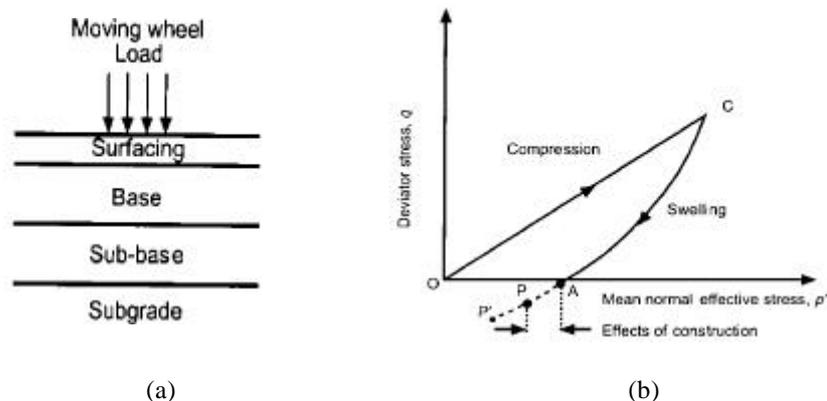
(a) Cross section of a pavement and (b) typical stress history of a pavement.
